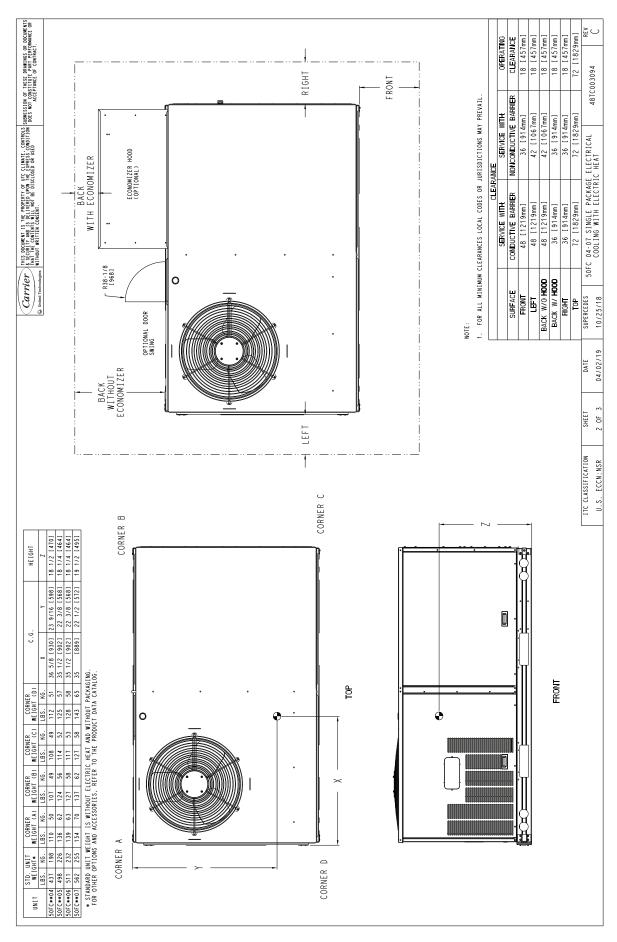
50FC\*\*04-07 Dimensional Drawing (cont)
